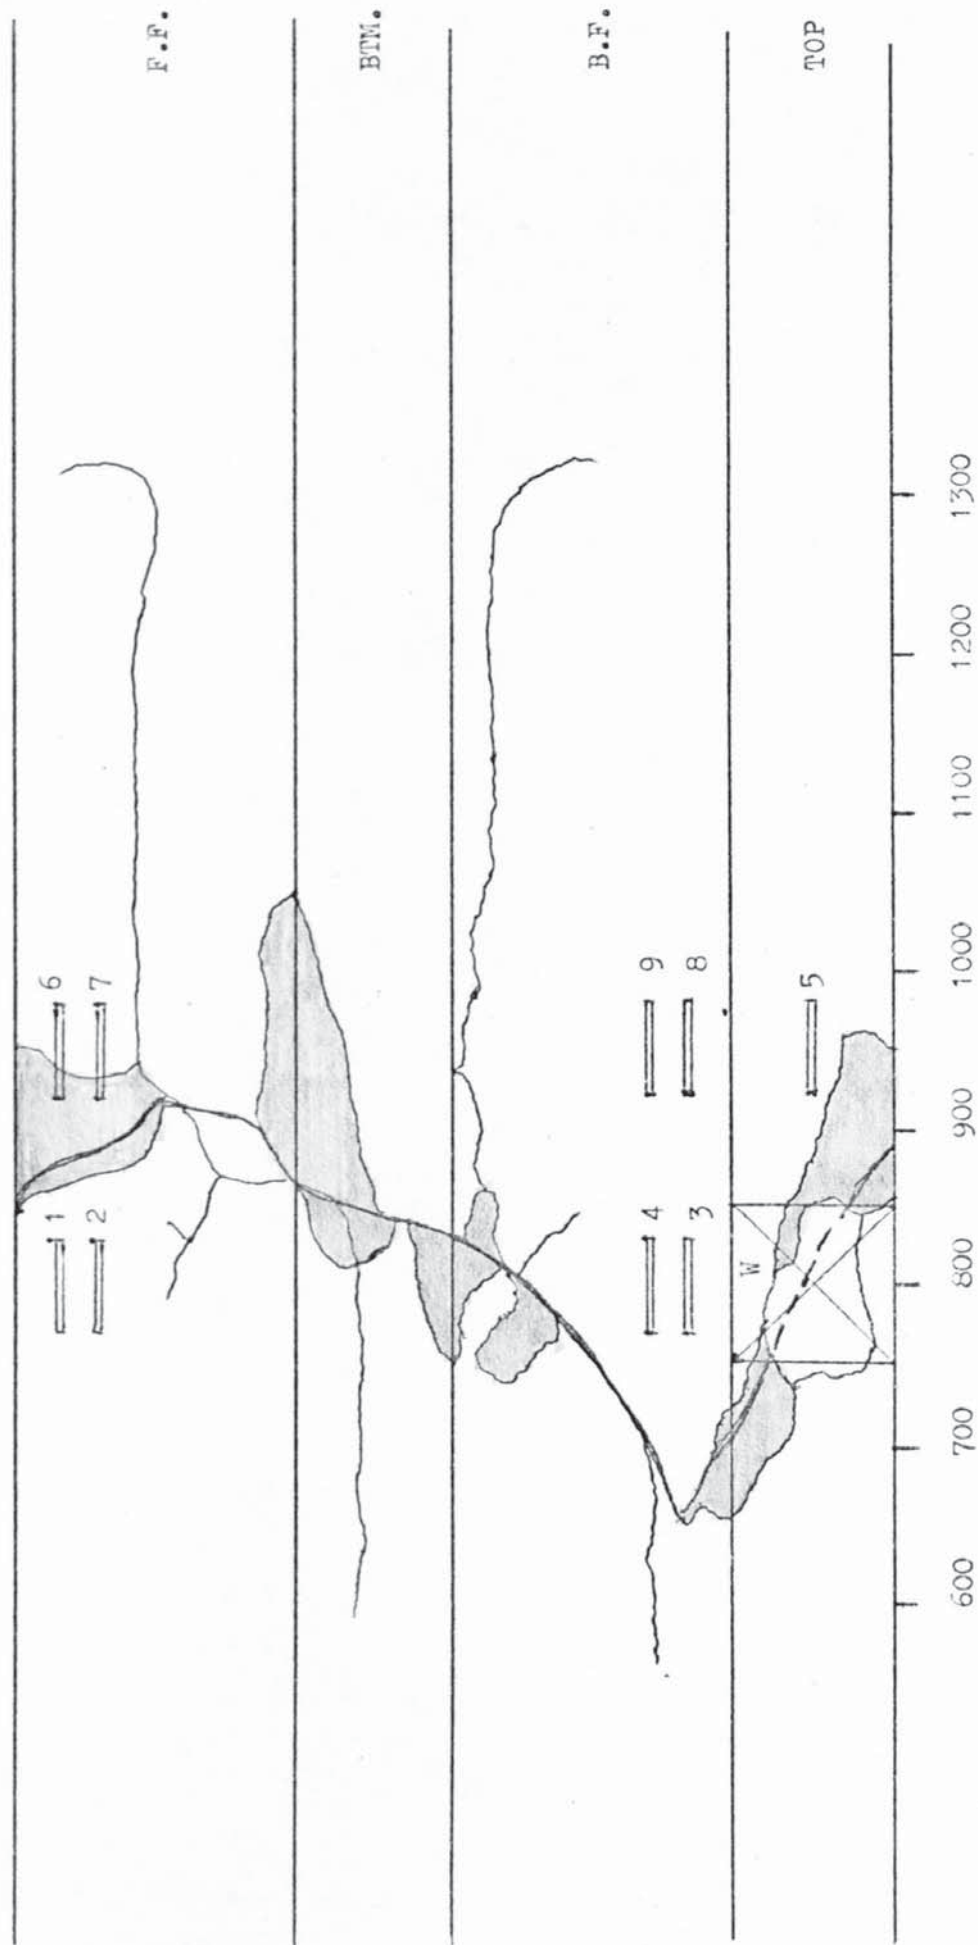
FAILURE CRACK PATTERNS - BEAM 10 (MODE 1)
